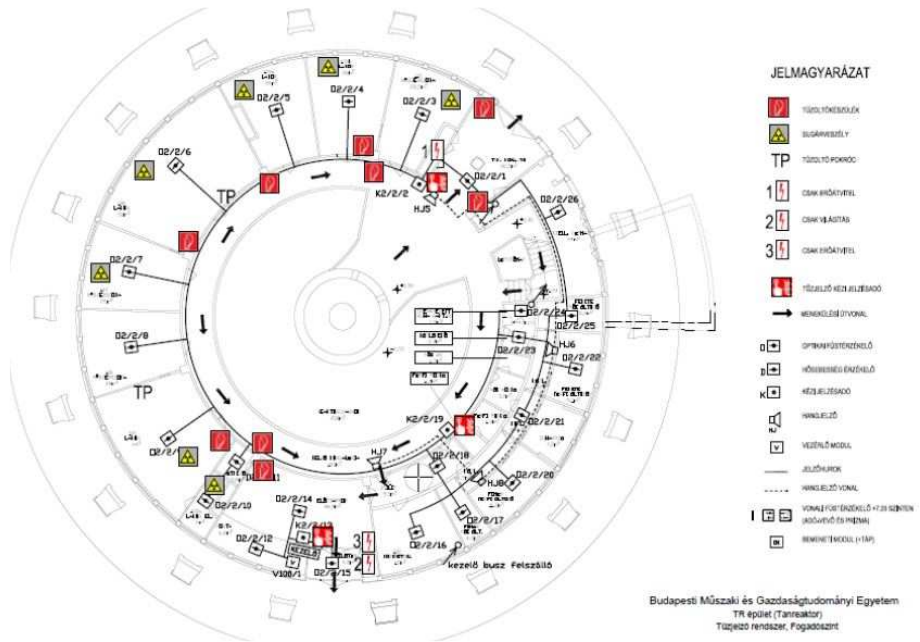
Location of fire alarm and fire suppression equipment on the ground floor
